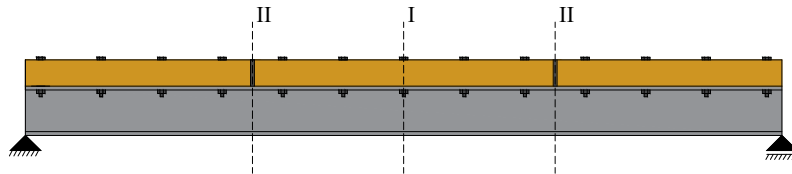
cross-sections that may be critical for failure: (I) midspan cross-section and (II) cross-section at transversal gap.
